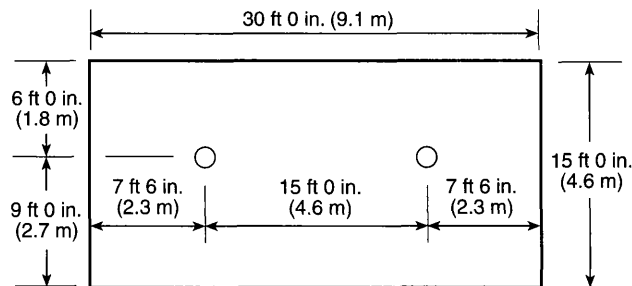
Maximum Distance from Walls.
